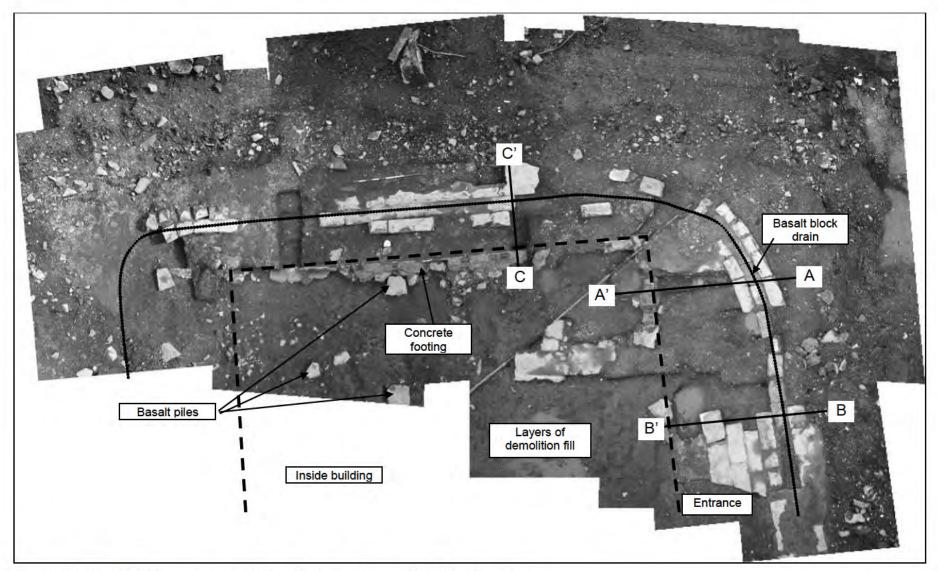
Plan view of Gymnasium excavation (photograph composite by Ben Thorne)
